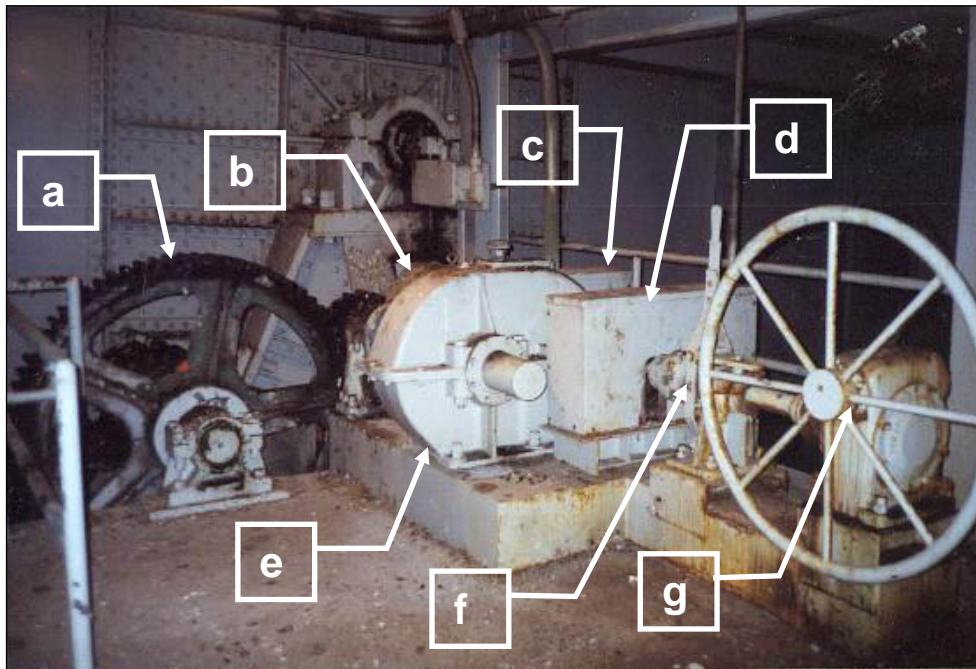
Type 2 Span Drive.
